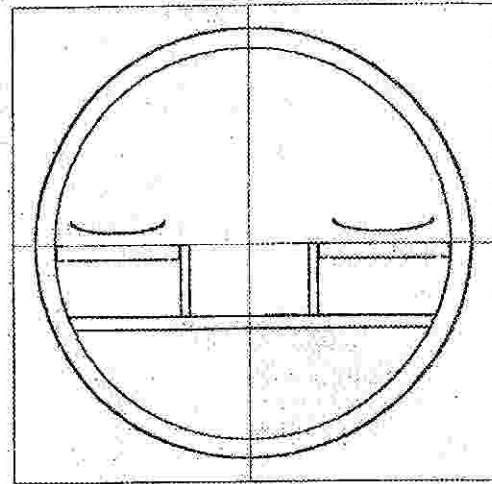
Cross-section of a belt conveyor bridge with two belt conveyors and a service walkway in the middle.
